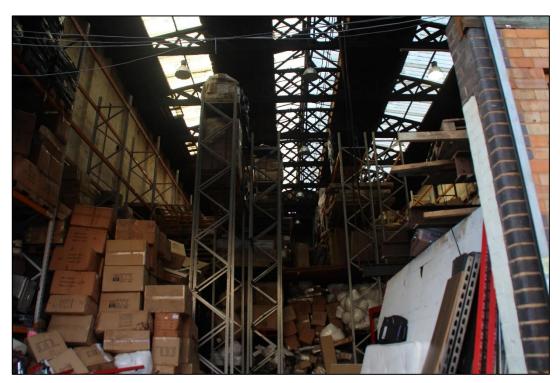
View of the Belfast roof truss of Building 2, seen from the entrance
